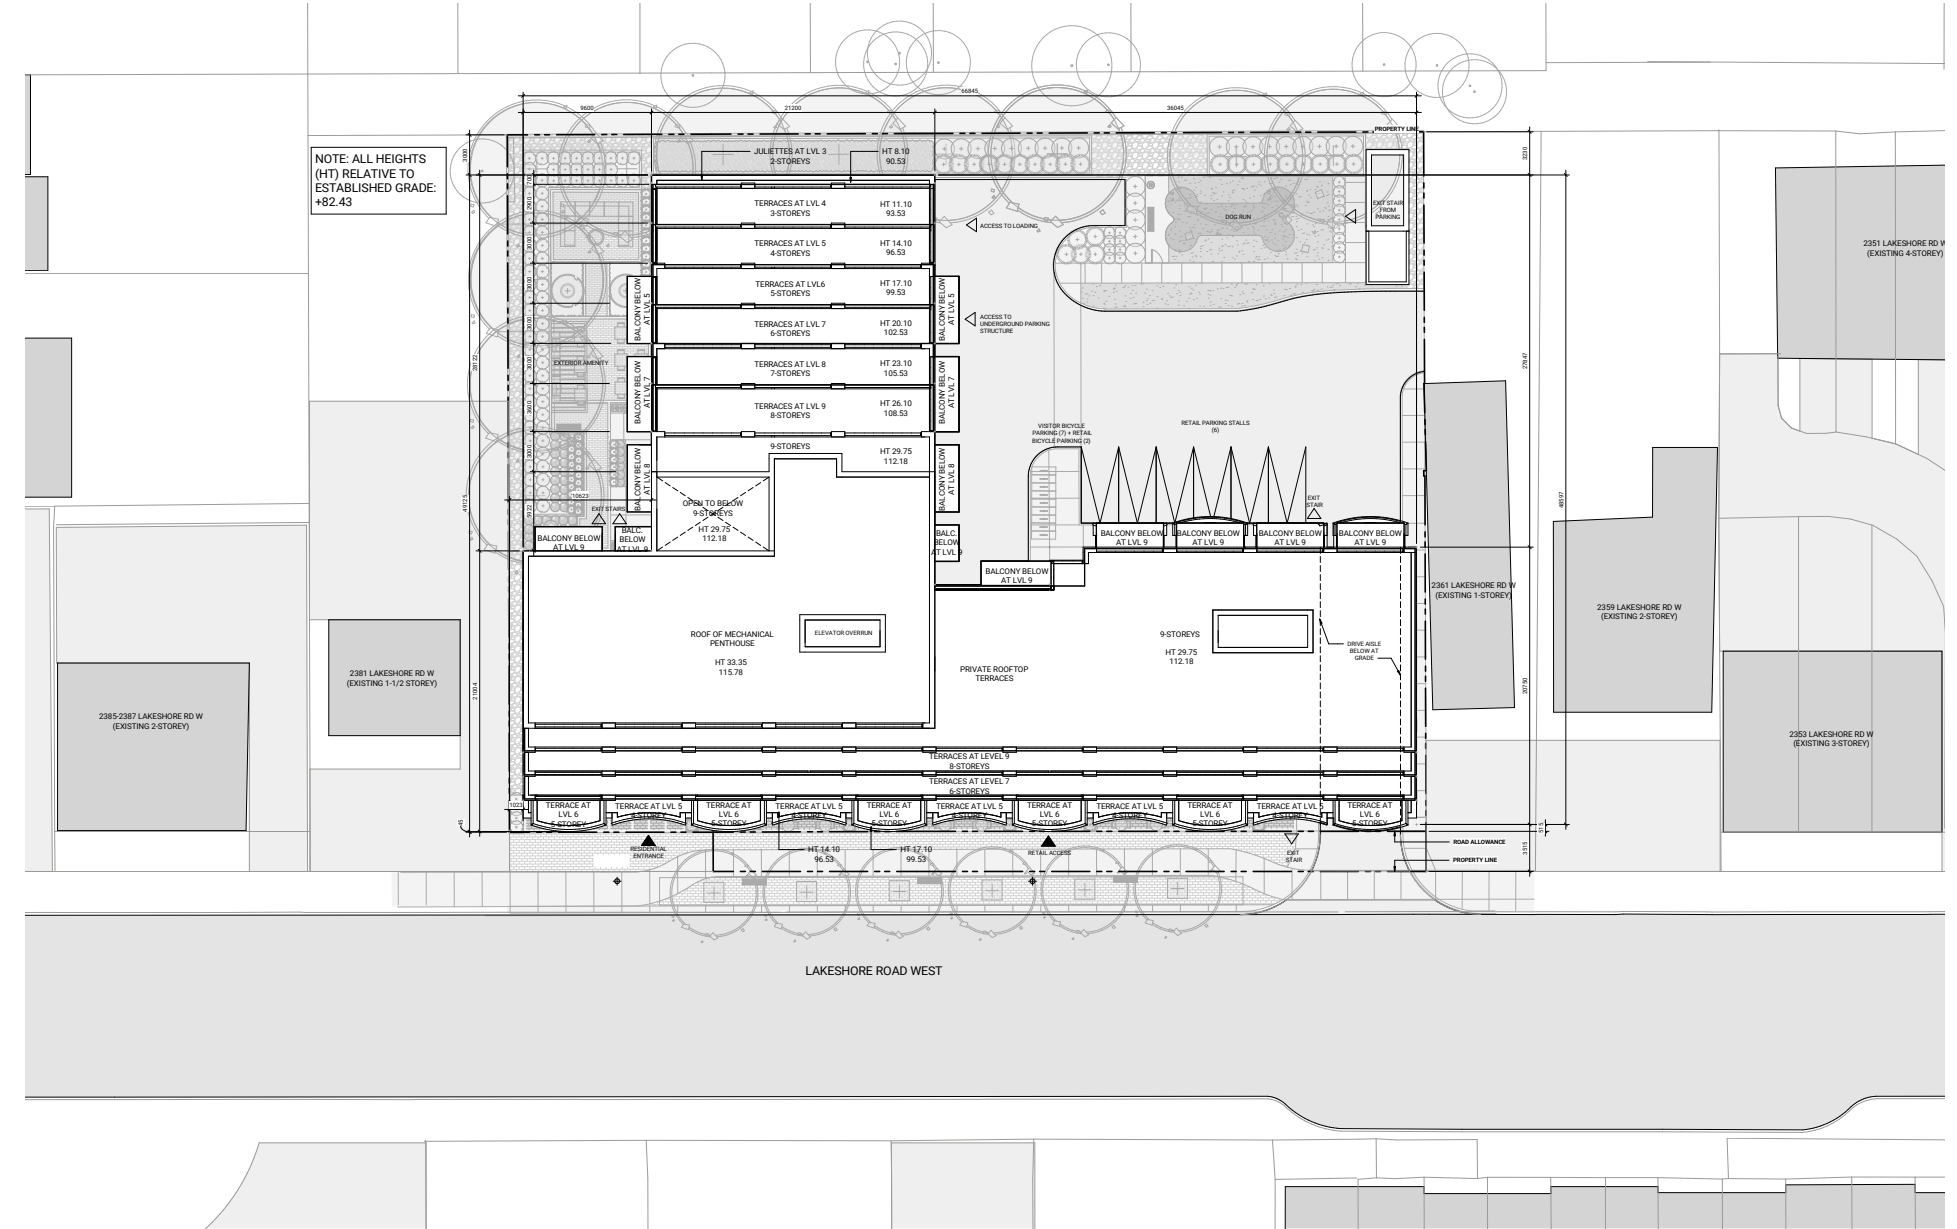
Site Plan (Prepared by Diamond Schmitt Architects)
